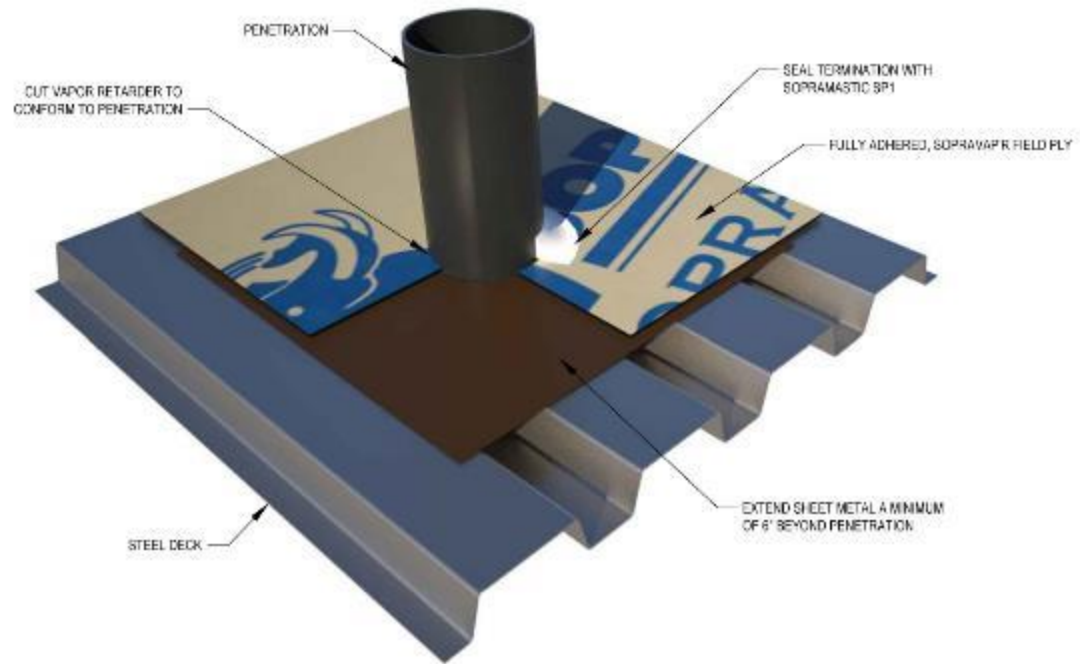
Fully Adhered, Self-Adhesive SOPRAVAP'R at Penetration On Steel Deck
